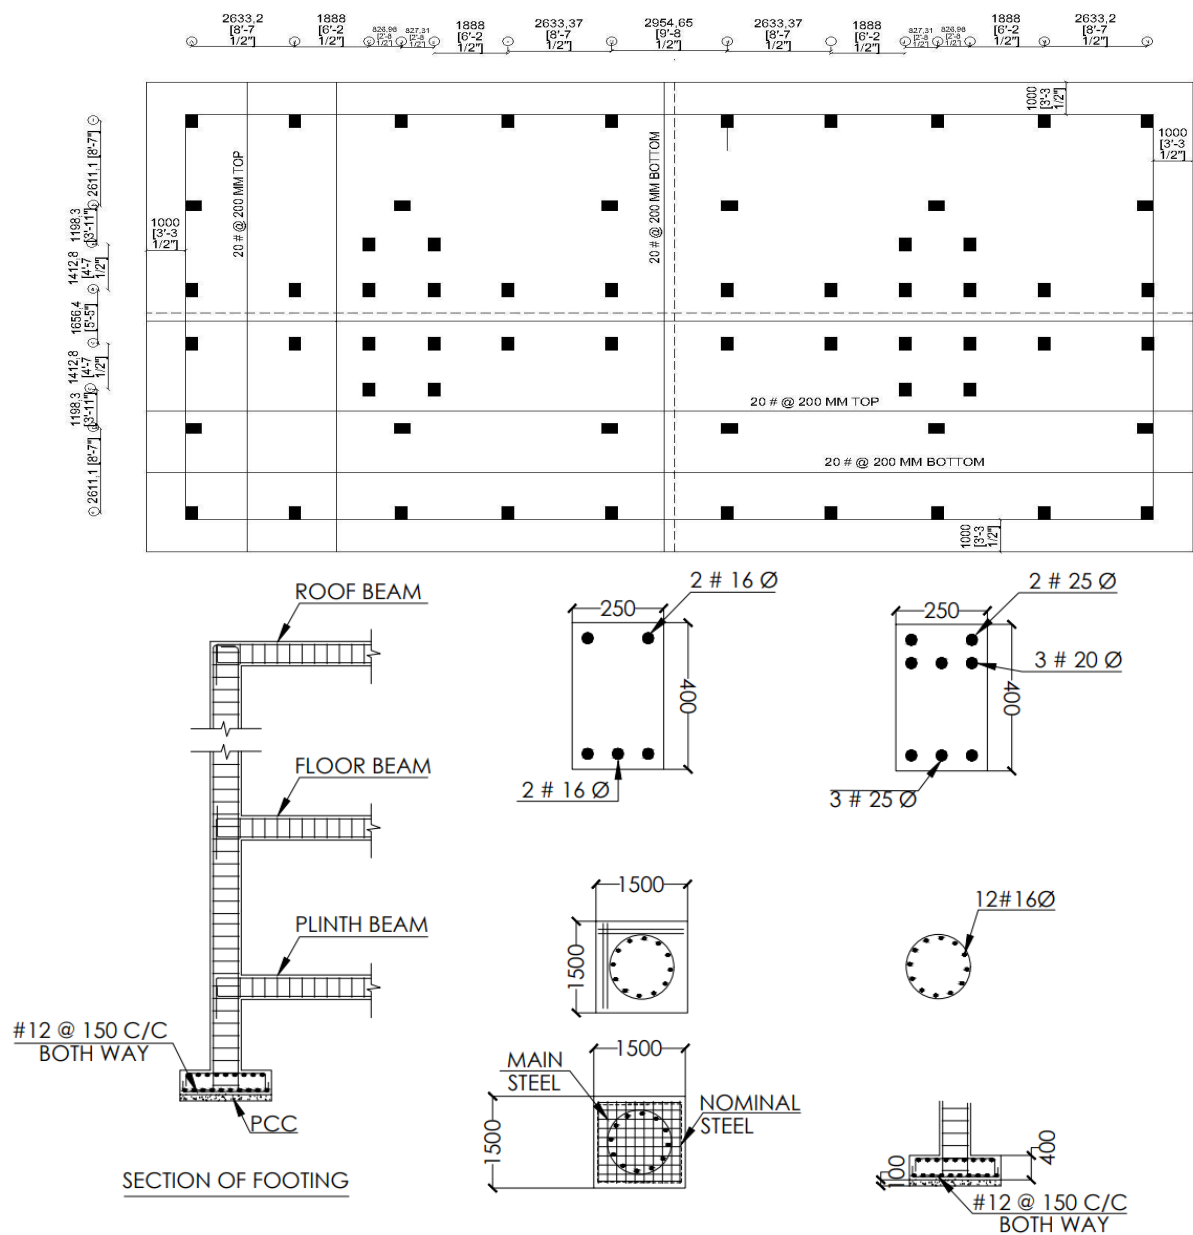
( d): The section plan of the footing in the raft foundation in resettlement units
